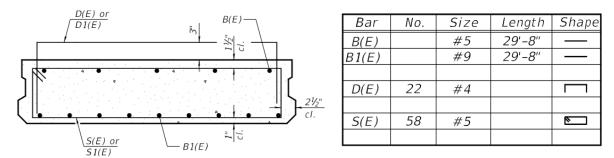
Reinforcement of precast concrete approach slab panel (IDOT, 2017)
